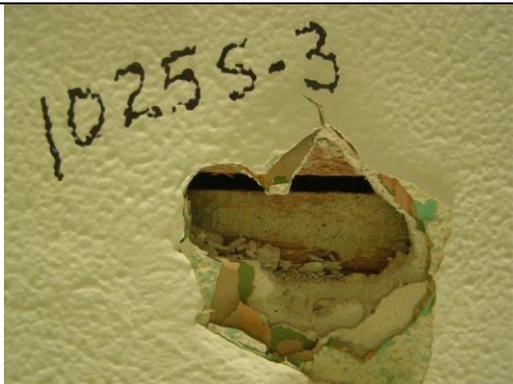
Plaster (1025S-3) Living Room, Wall A. No Asbestos Detected.
